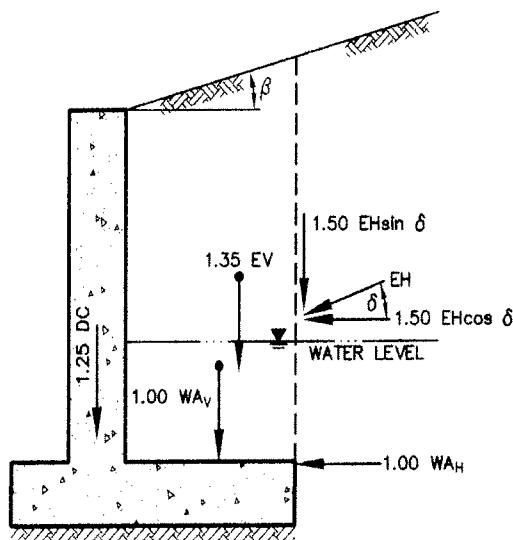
Typical Application of Load Factors for Bearing Resistance.
